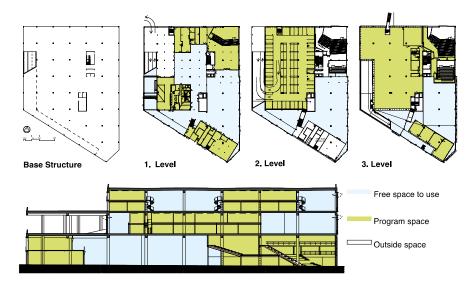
GROUND FLOOR PLANS SHOWING FIXED SPACES (GREEN SHADING) AND FLEXIBLE SPACES (LUGHT BLUE SHADING); SECTION SHOWING PRIMARY CONCRETE STRUCTURE PLUS SECONDARY STEEL STRUCTURE (THE LATTER WITH GREEN SHADING). ©LACATON&VASSAL
